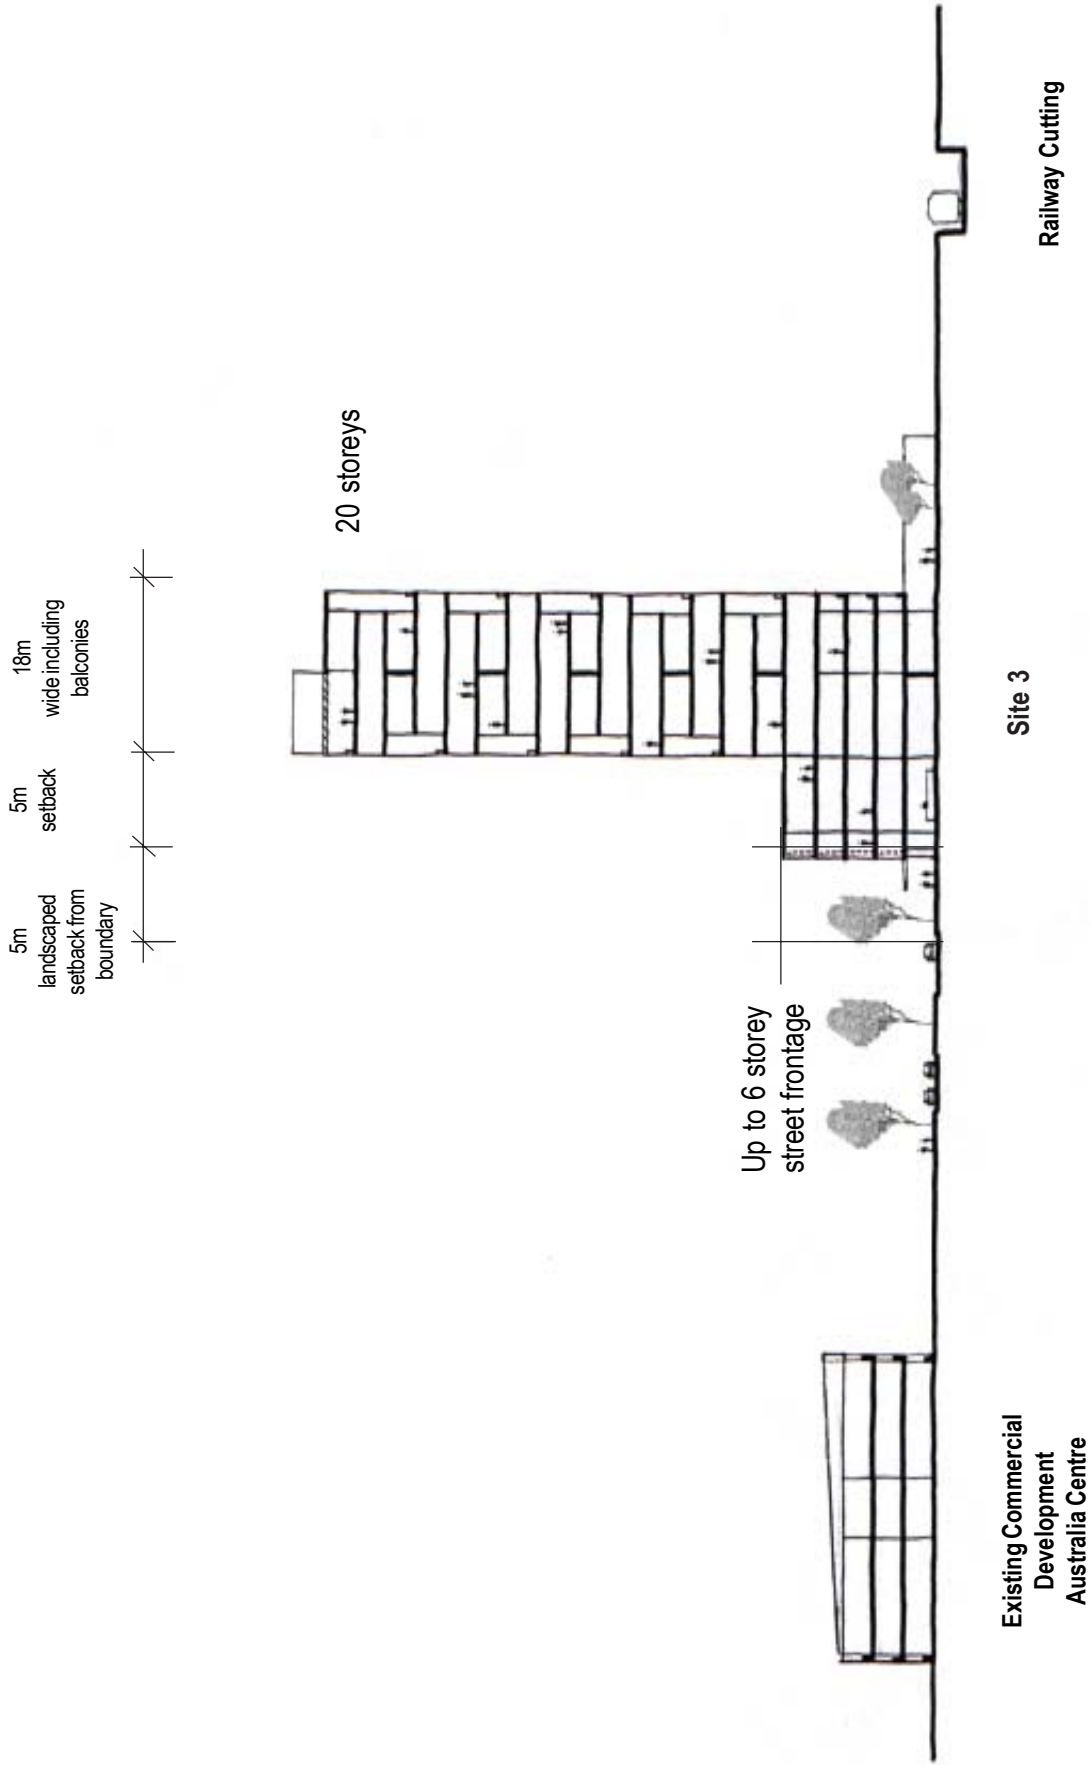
Indicative North South section through Australia Avenue and Site 3
